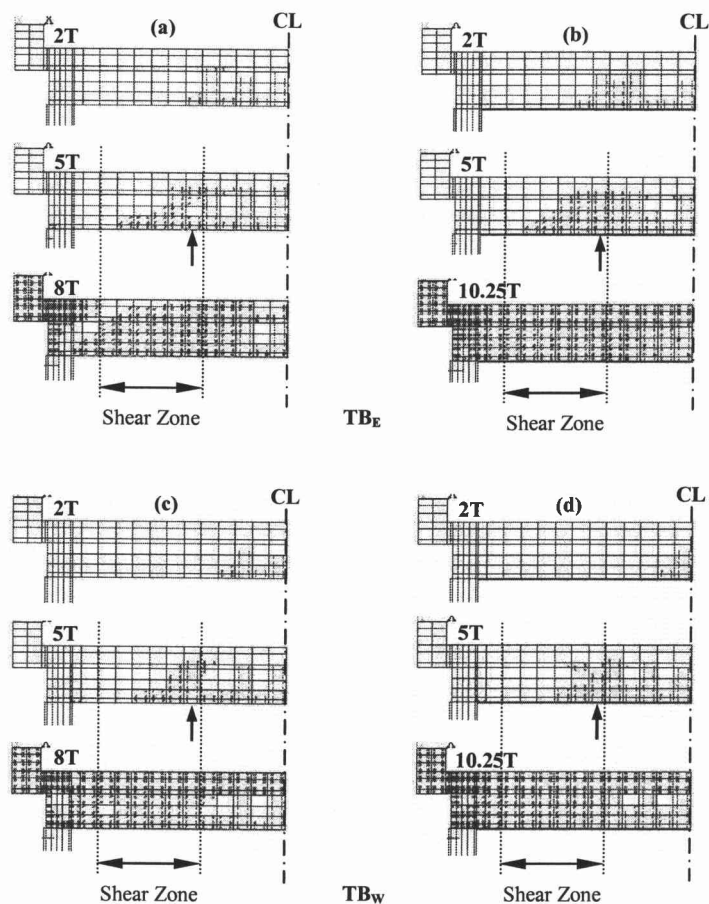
Crack Propagation in Transverse Beams (Scaled Truck Loading): (a) and (c) Unstrengthened Bridge; (b) and (d) FRP-Strengthened Bridge
